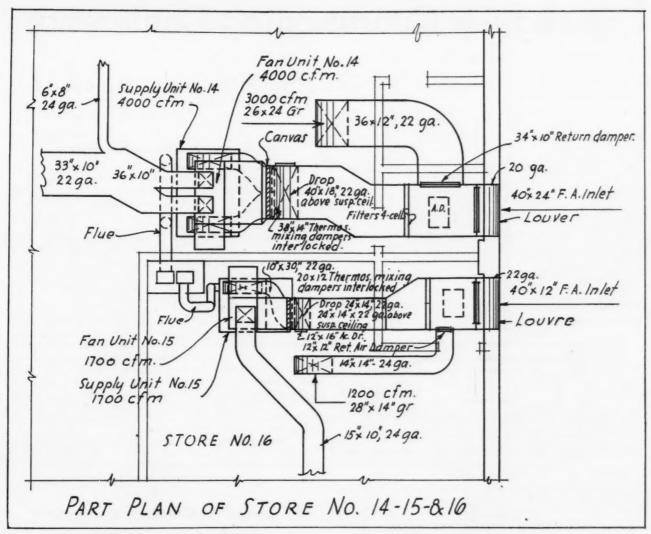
Detail of equipment layout for the largest store and a small store inset within the larger space.
